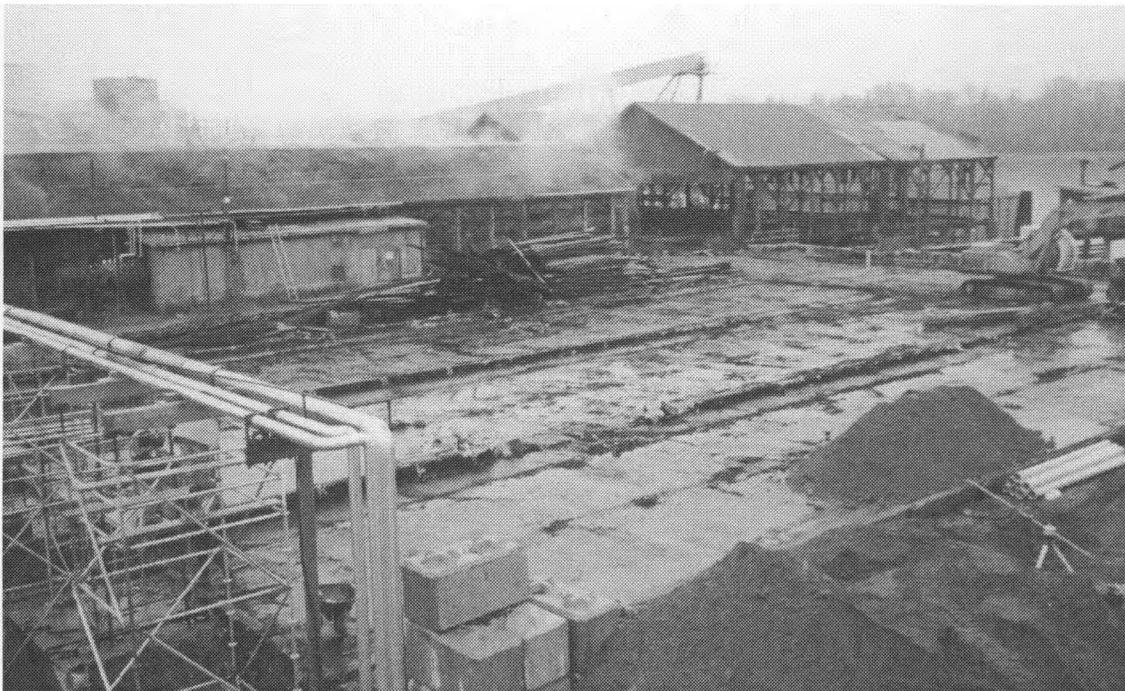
2. Pre-monitoring view of old Kiln Building Concrete Foundation subsequent to removal of the Kiln Building, looking southeast. An identical building is in the upper left.
